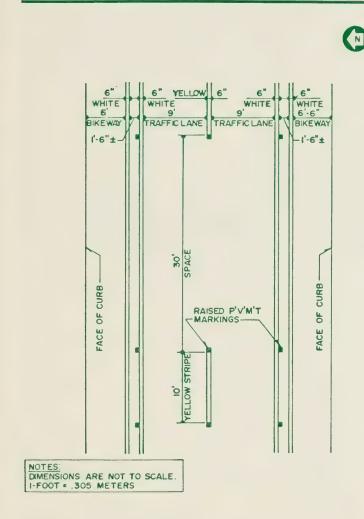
South Lake Orlando Parkway test pavement treatment.
